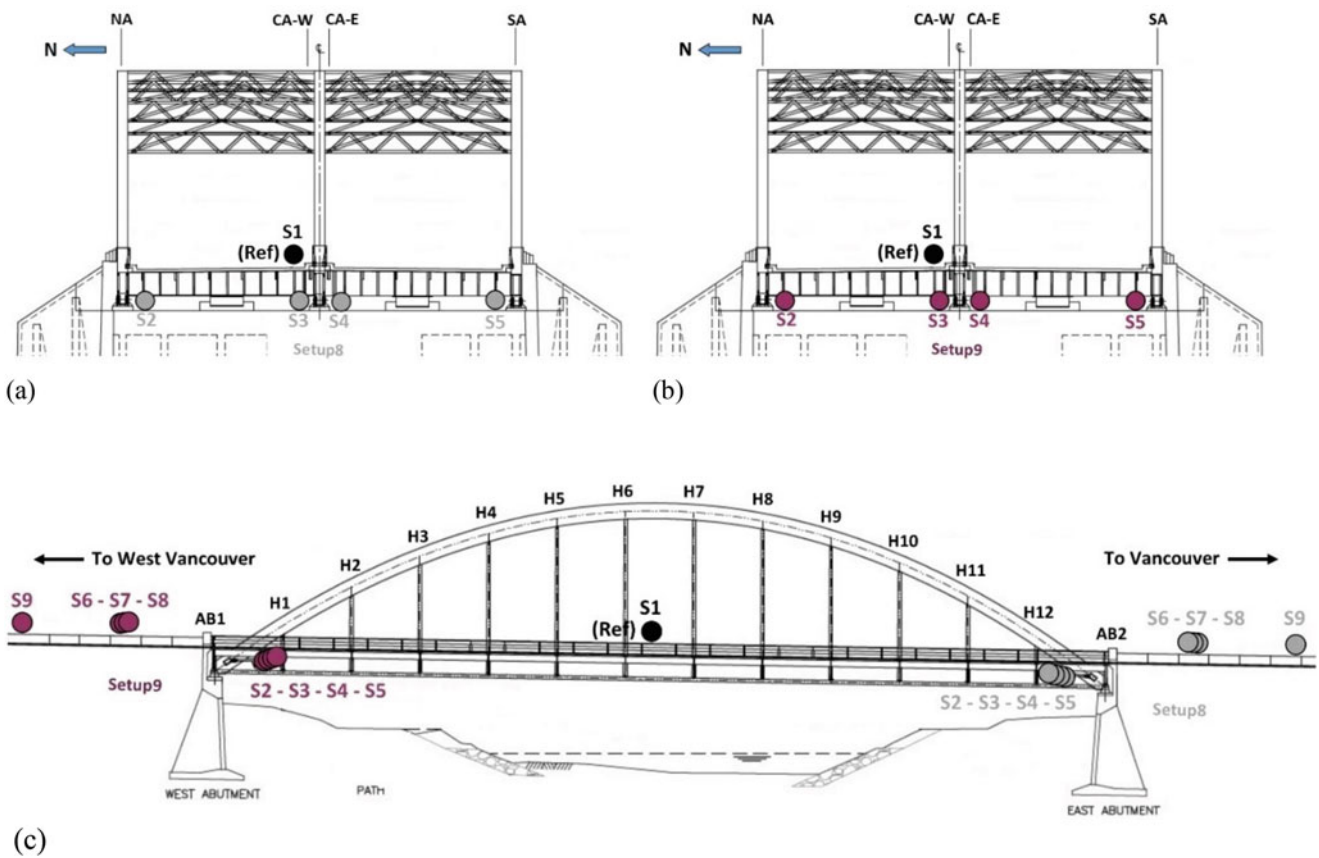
Sensors' layout on the abutments and embankments: (a) Setup 8 at east side of the bridge (the sensors located on the embankments are not shown); (b) Setup 9 at west side of the bridge (the sensors located on the embankments are not shown); (c) Setups 8 and 9 shown in longitudinal section of the bridge
